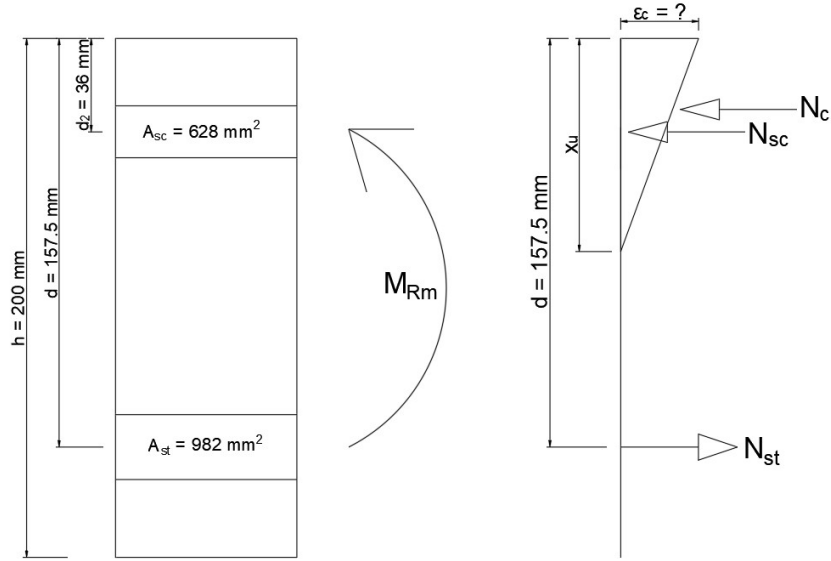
Longitudinal beam section and horizontal equilibrium through internal normal forces in the concrete and steel reinforcement bars.
